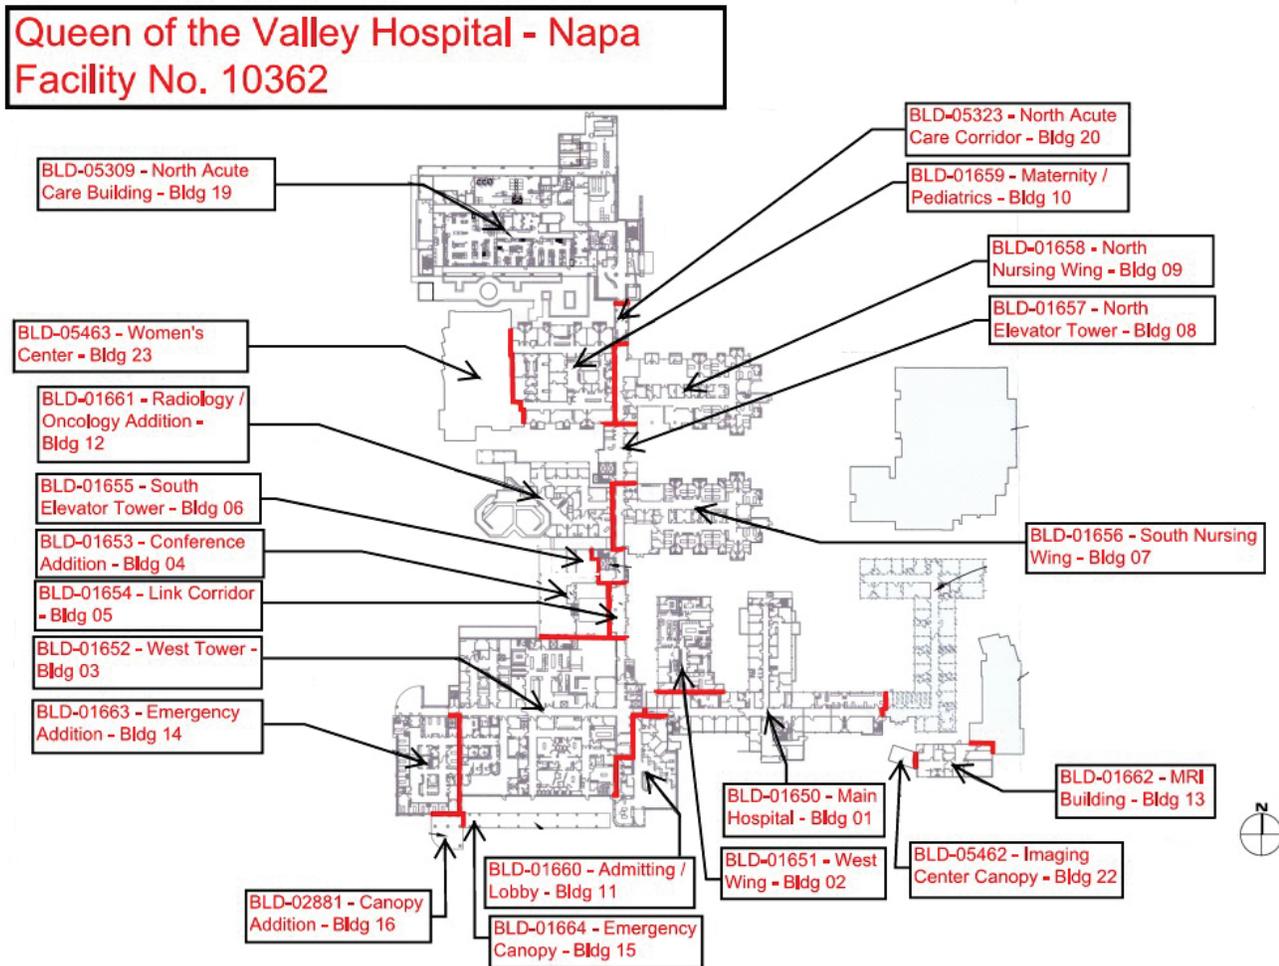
Queen of the Valley Hospital site plan indicating building numbers. Red lines indicate structural building separations.
